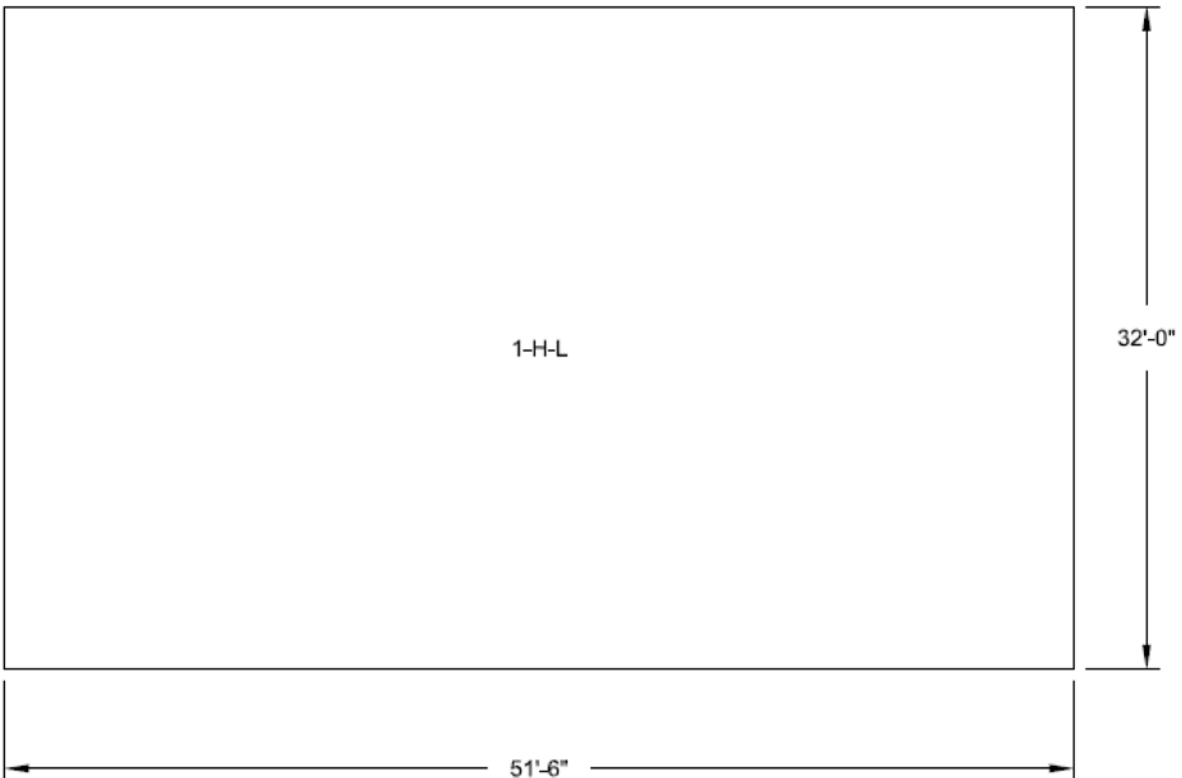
H.6-147 DGFOV Roof 2 Looking Down Horizontal Reinforcement Zones Near Side Face
